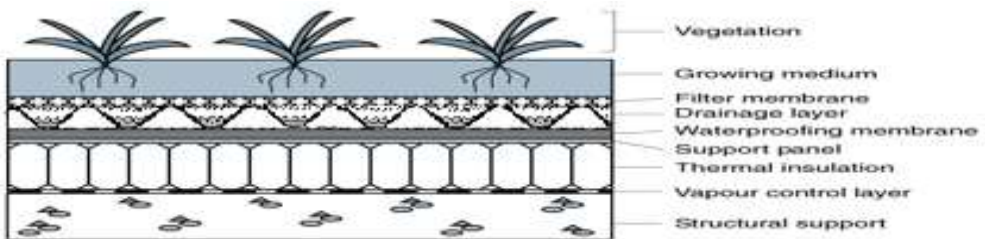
Typical Structure of Extensive Green Roof (Hui, 2006).
